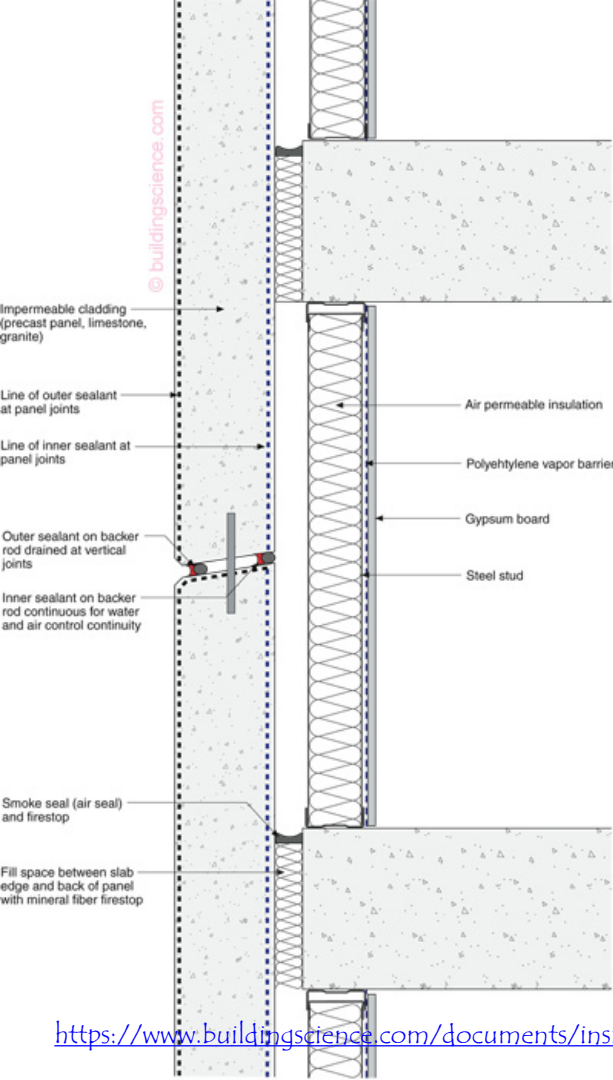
Intersection between horizontal and vertical two-stage joints in an external wall
